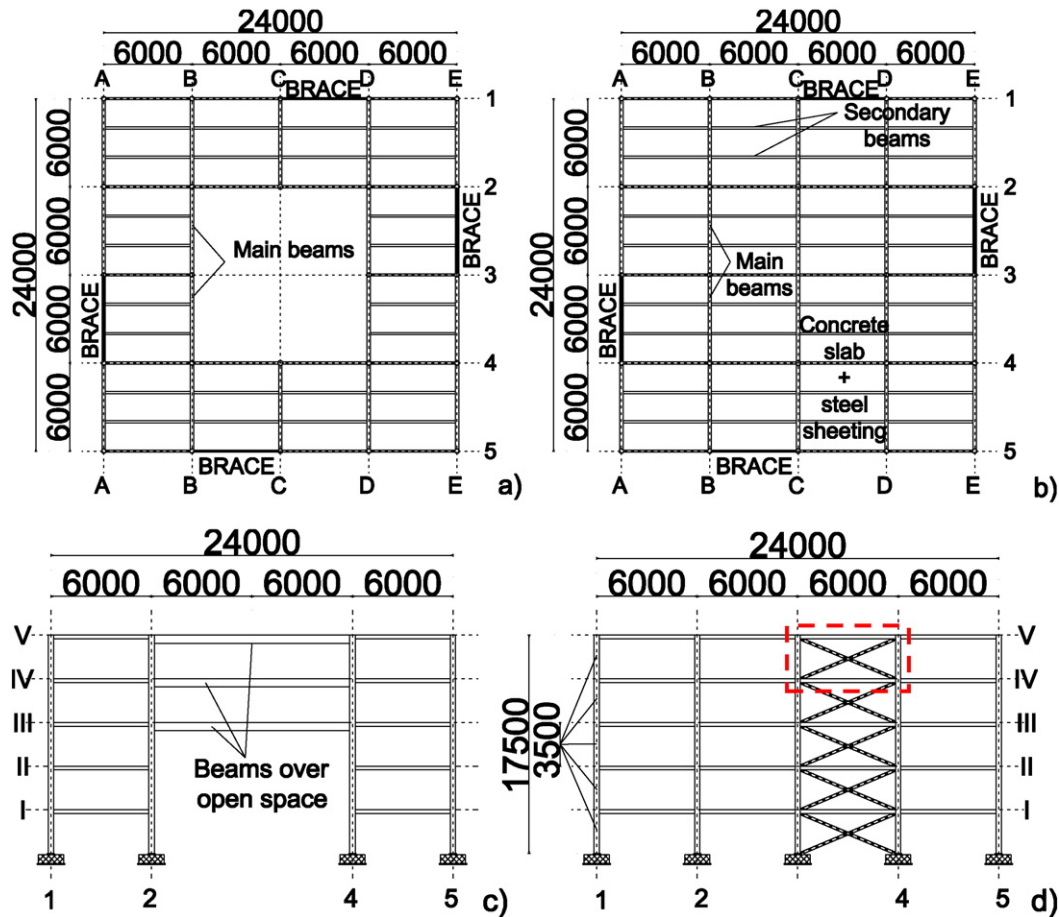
Reference structure; a) plan of 1st and 2nd floors; b) plan of 3th, 4th and 5th floors; c) C–C cross section; d) A–A cross section. Dimensions in mm.
